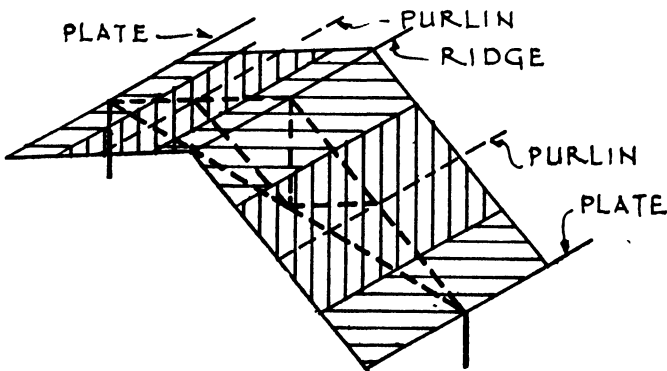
Proportion of Truss Load carried by Ridge, Plate and Purlins.
